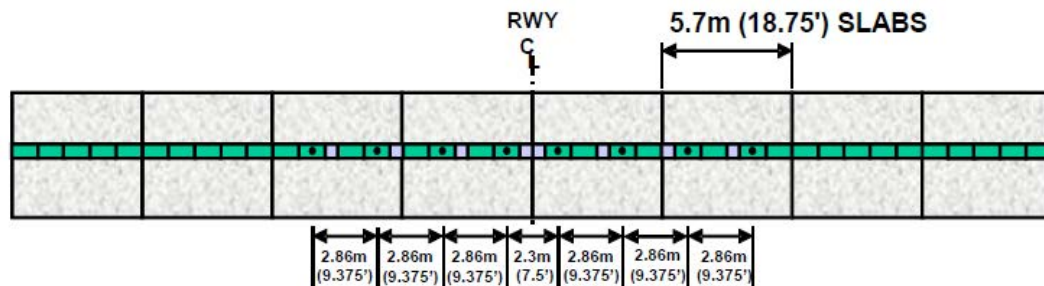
Cable Tiedowns for Panels Placed on 5.7-Meter (18.75-Foot) Slabs
